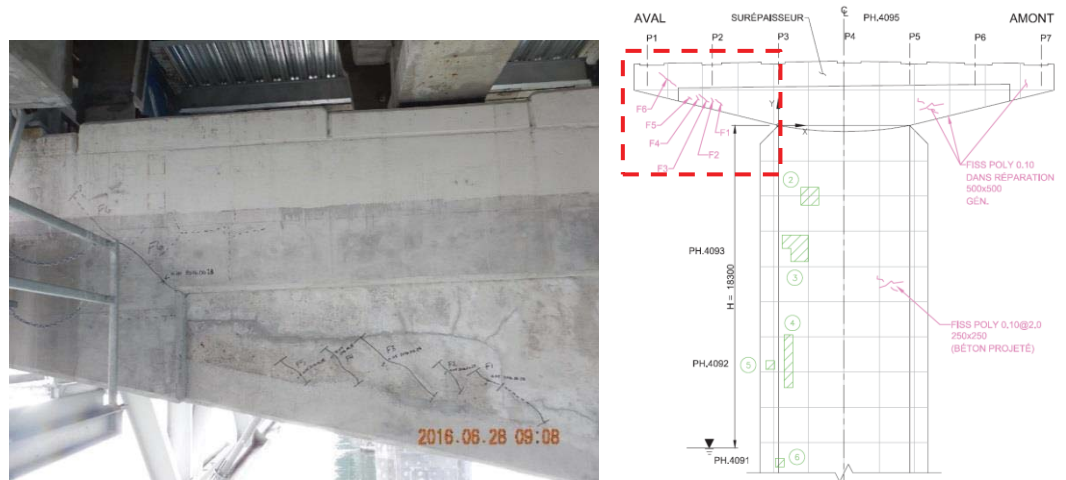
Observed Signs of Deterioration on Pier Caps (hown)
